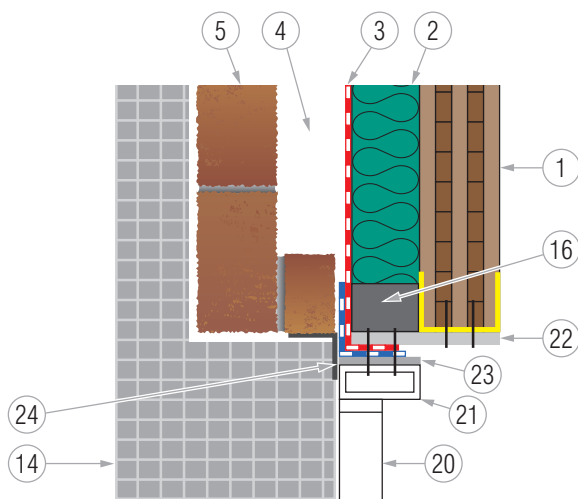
External drainage detail around CLT external walling and level door threshold - see Fig 2.9a and 2.9b.
